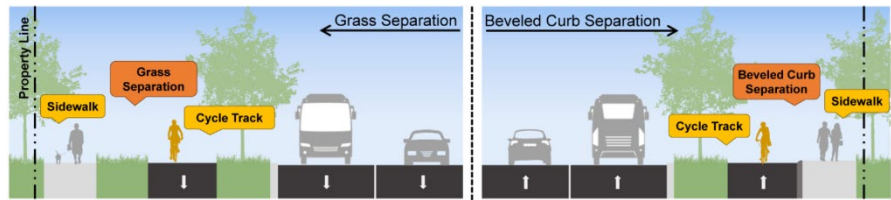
Illustration showing the two conditions for cycle track and sidewalk separation for the proposed changes on Bathurst Street between Steeles Avenue West to Sheppard Avenue West.
